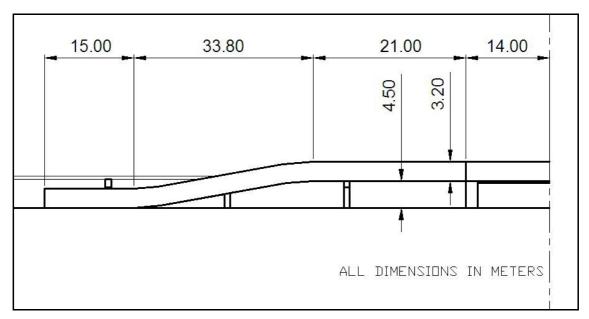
Side View On/off Switch Cover Dimensions
